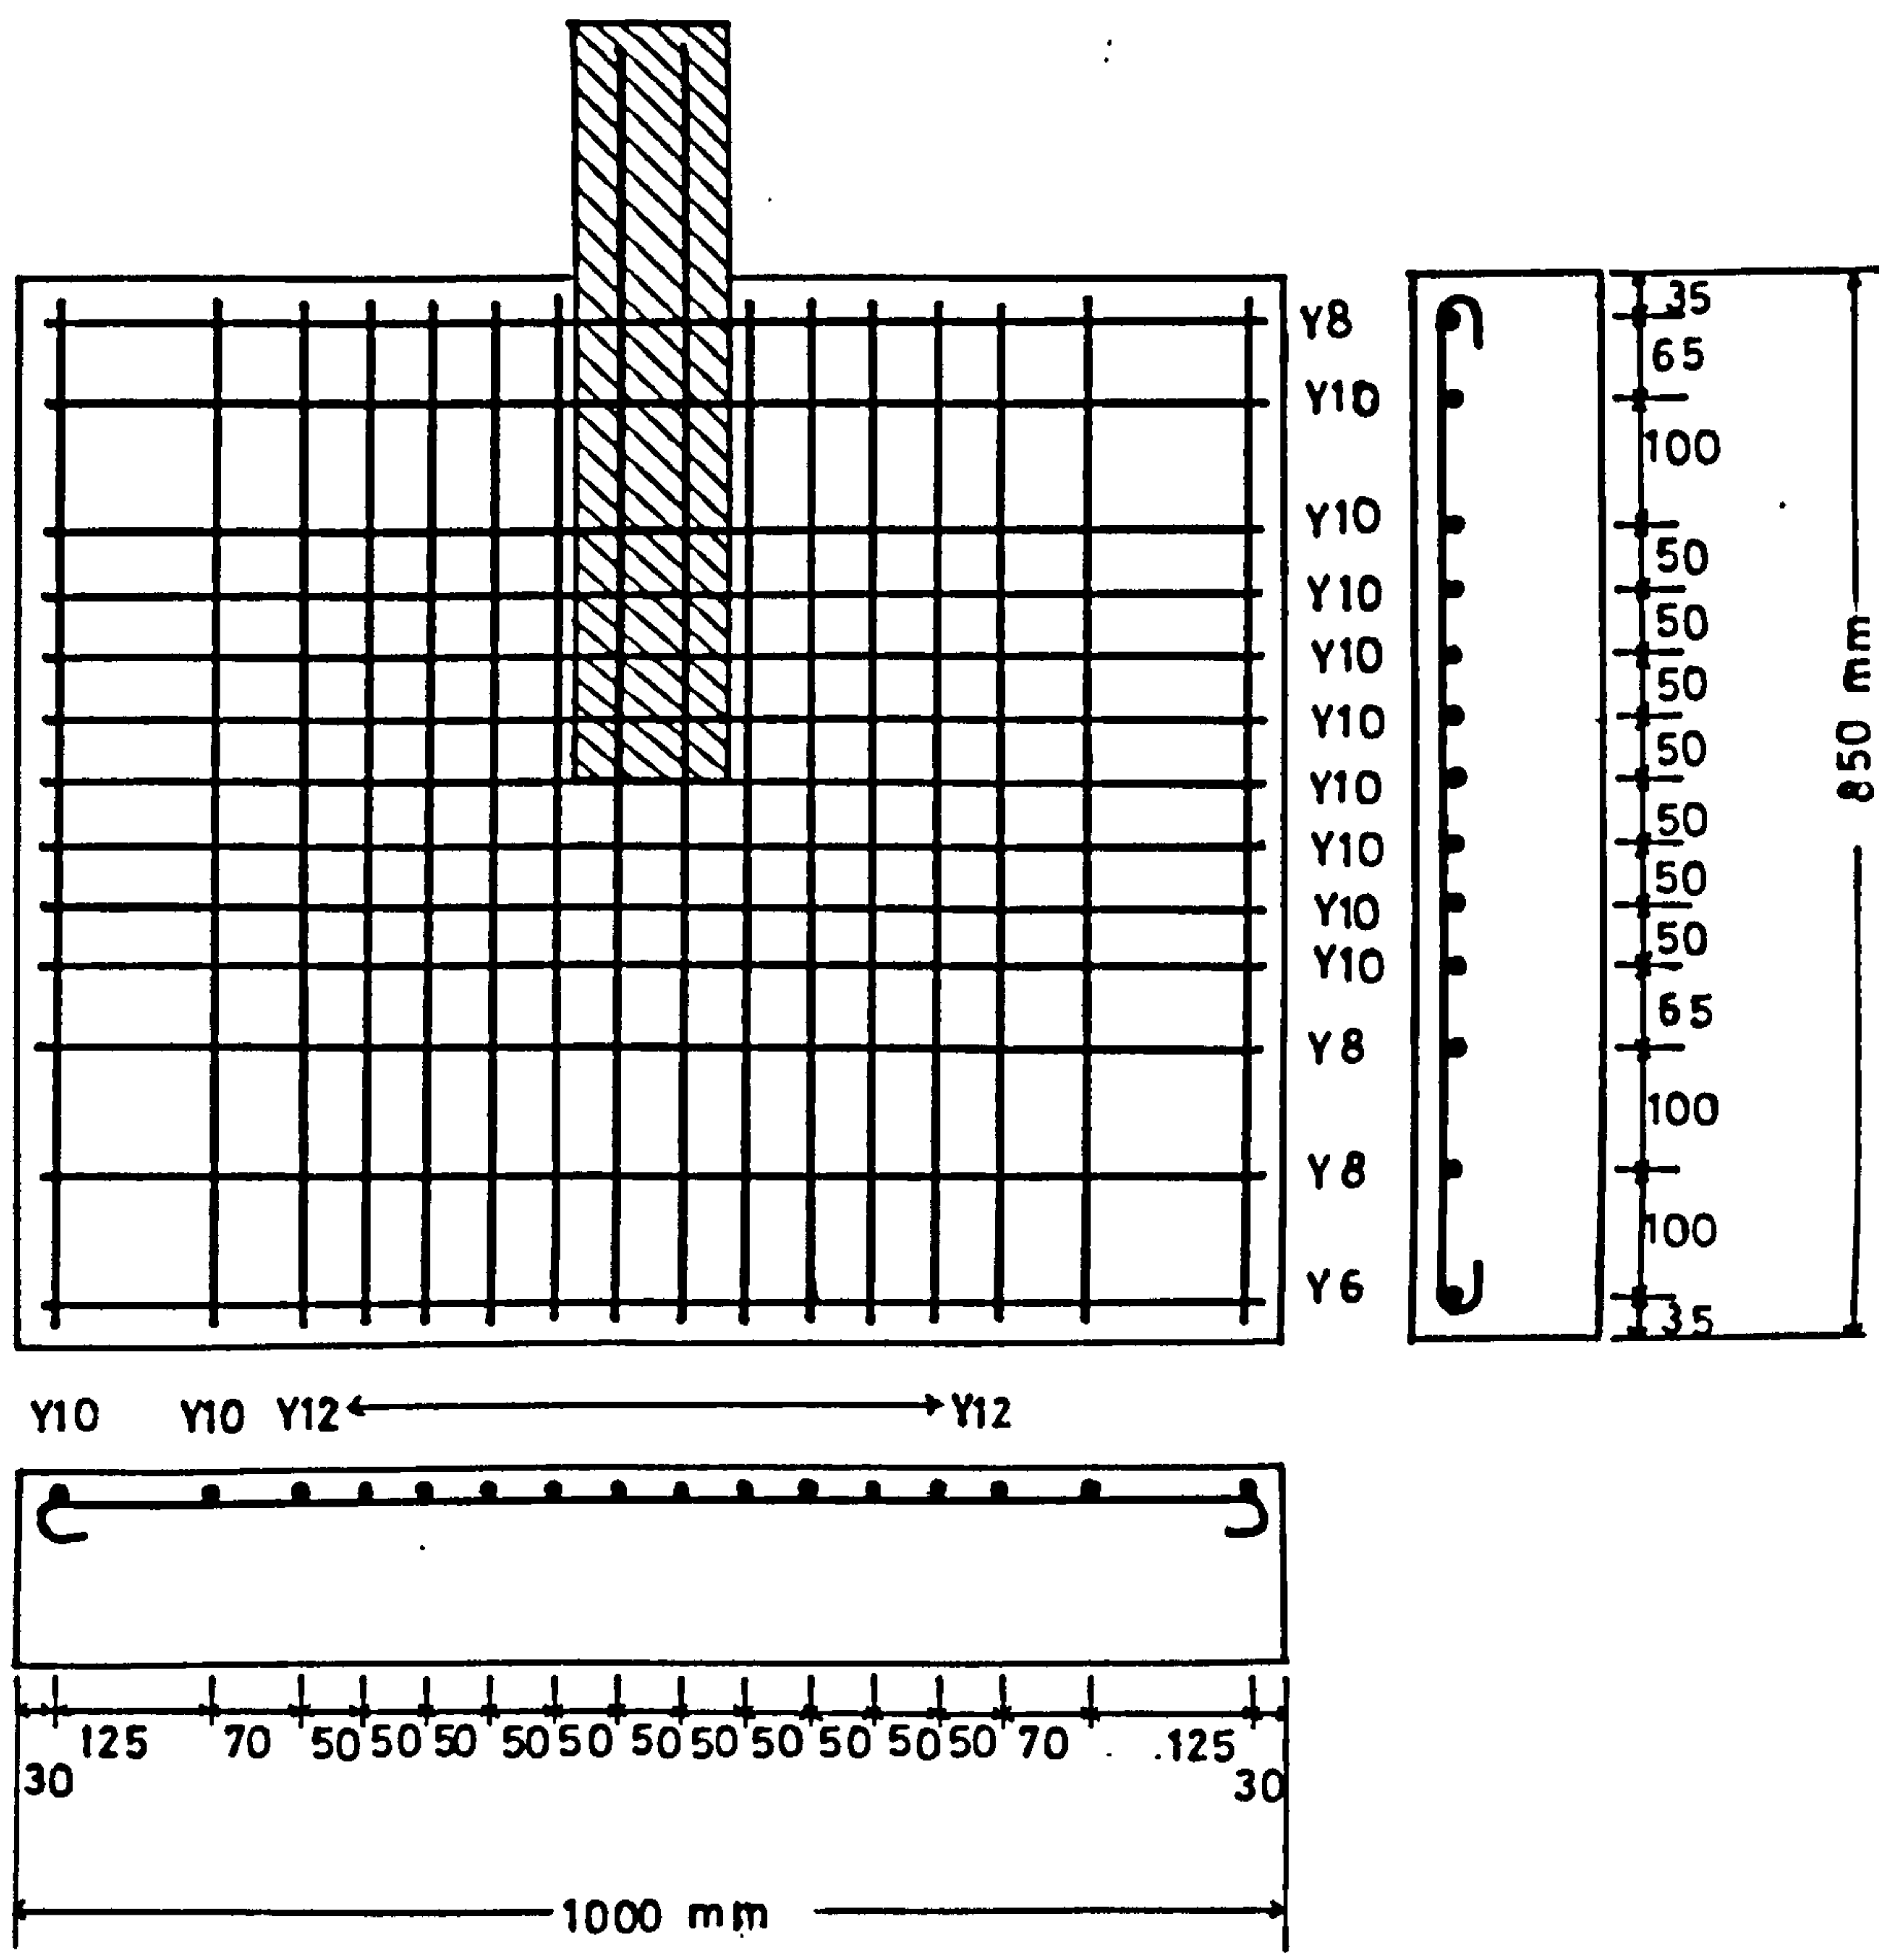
Arrangement of reinforcing bars in the slab of model MT3.
